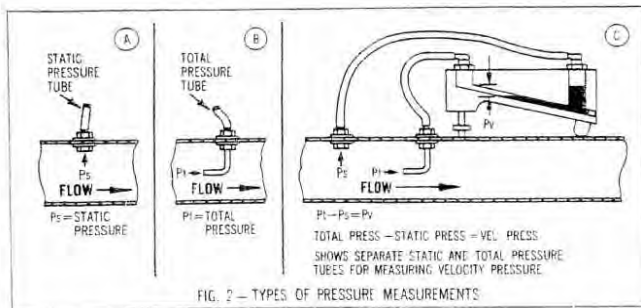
TYPES OF PRESSURE MEASUREMENTS
